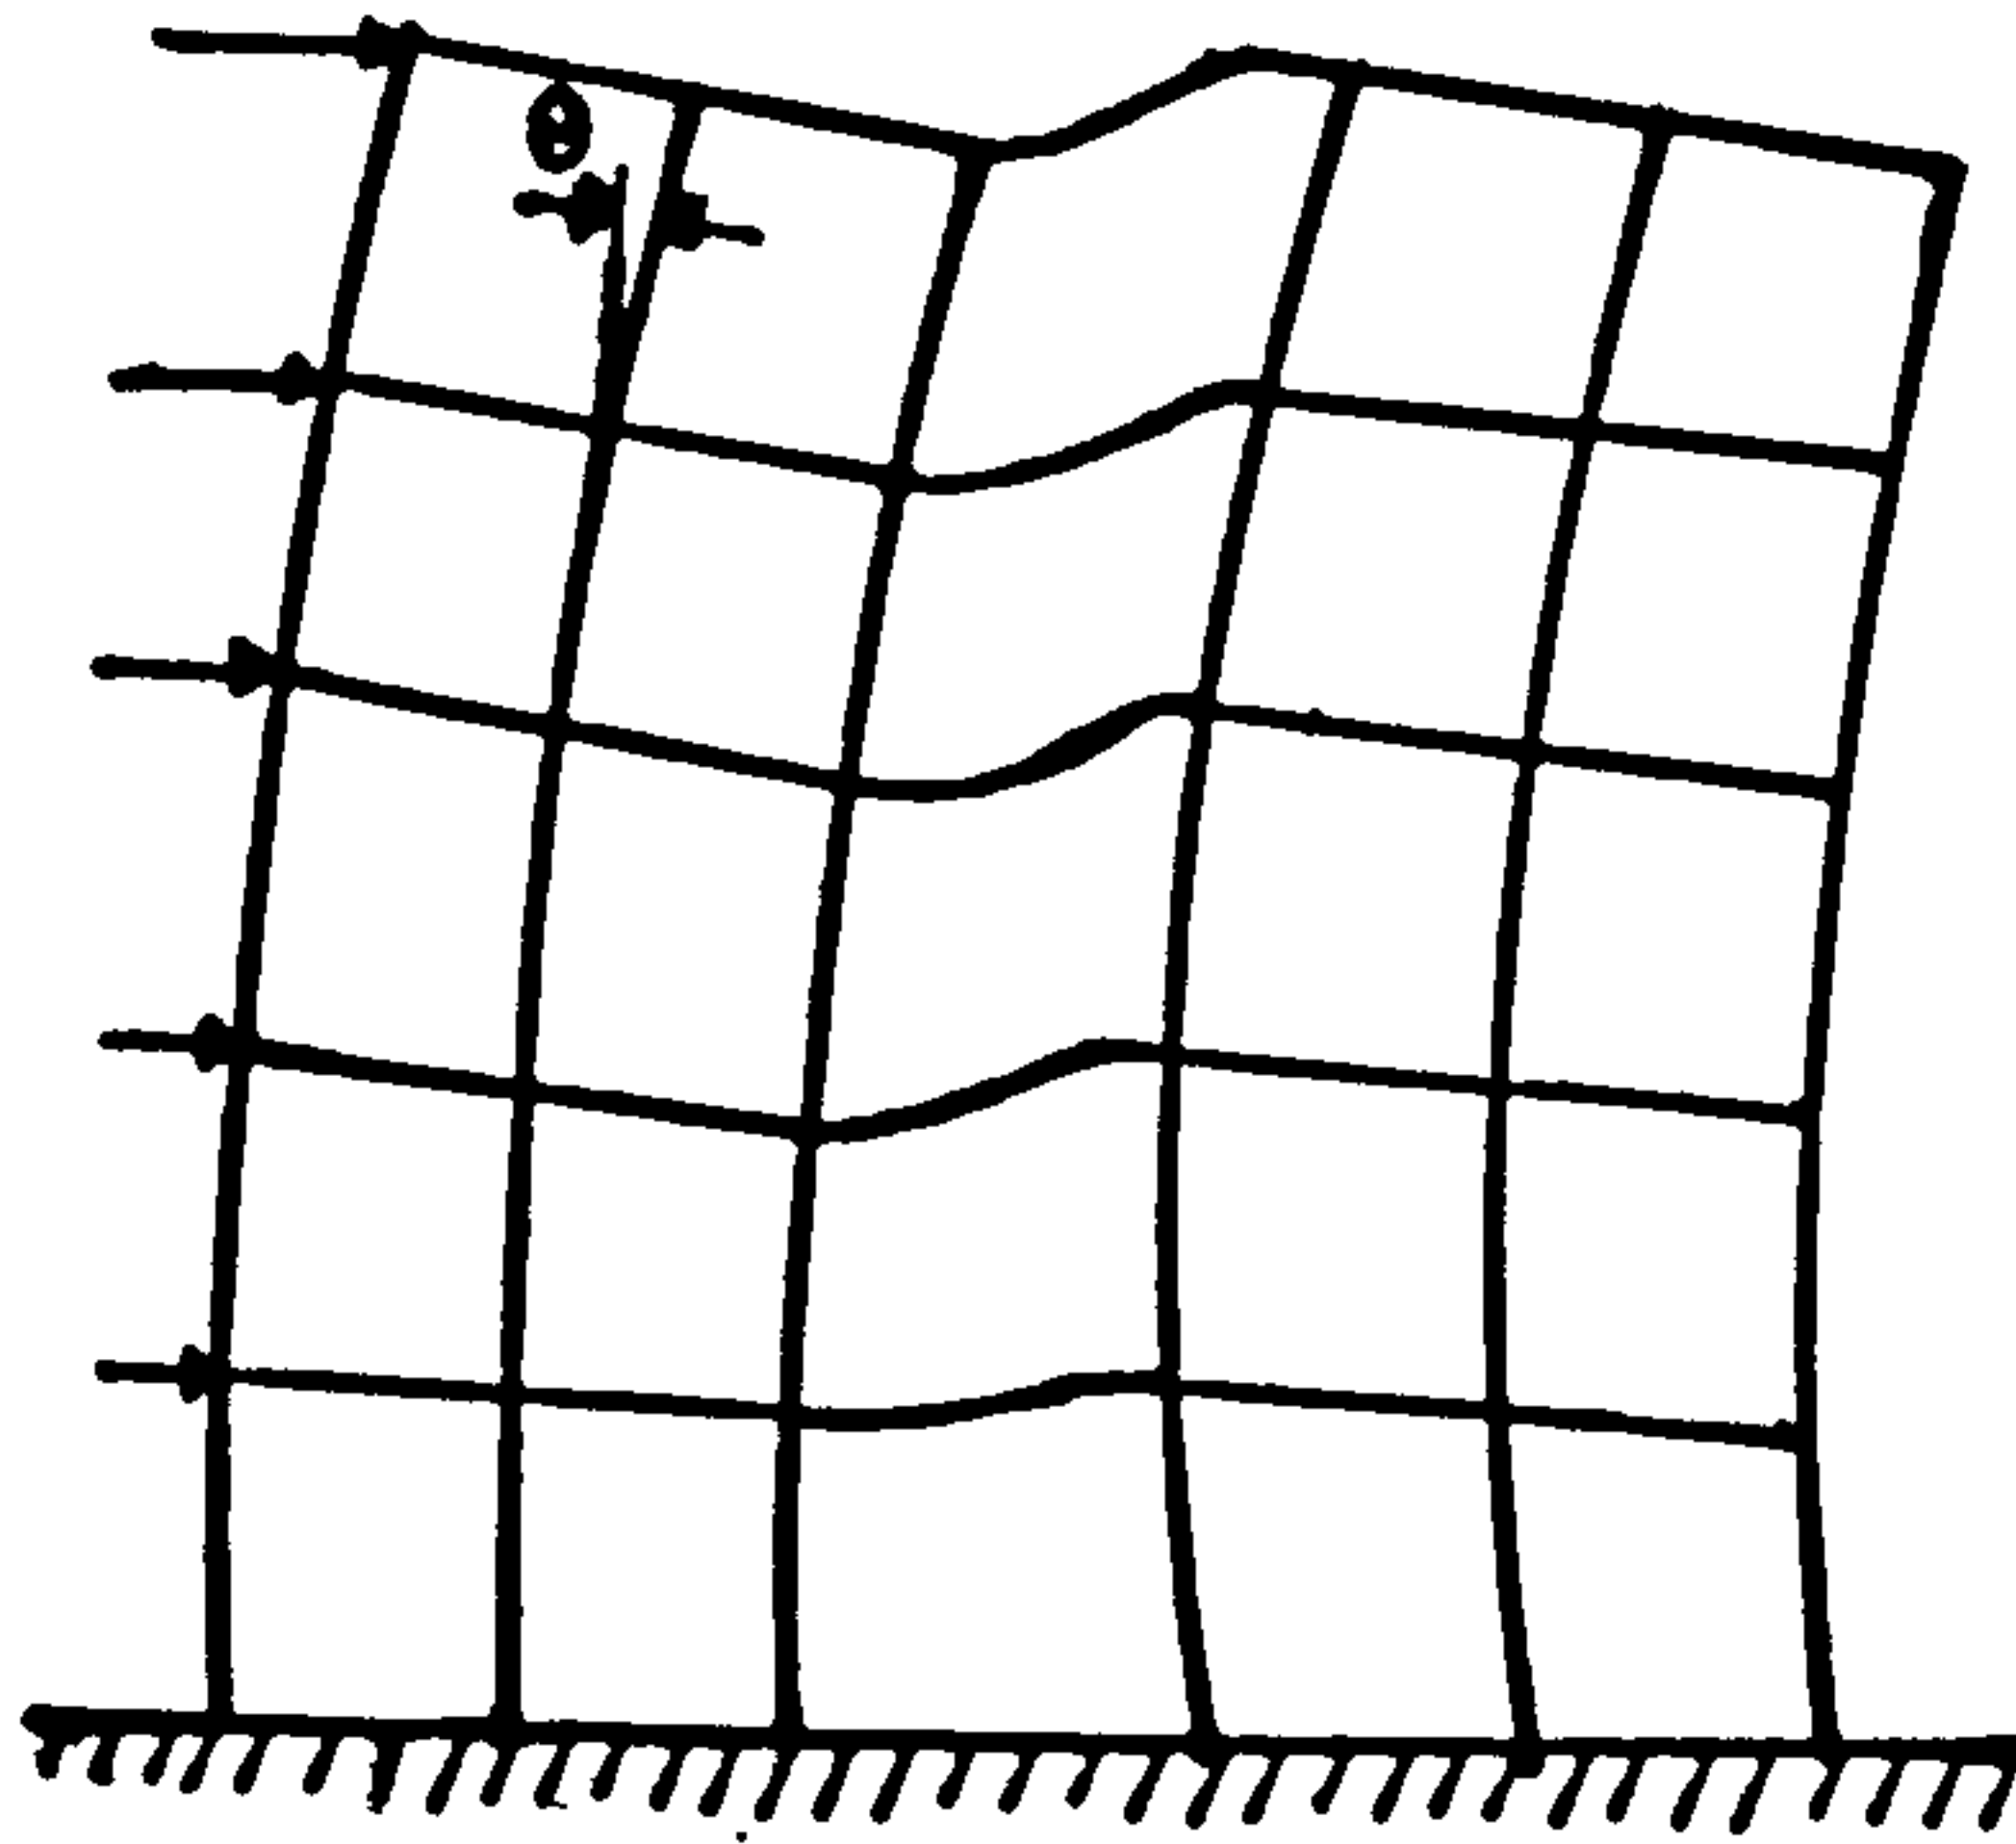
Deflected shape of a typical shear wall - slab structure subjected to lateral loads.
